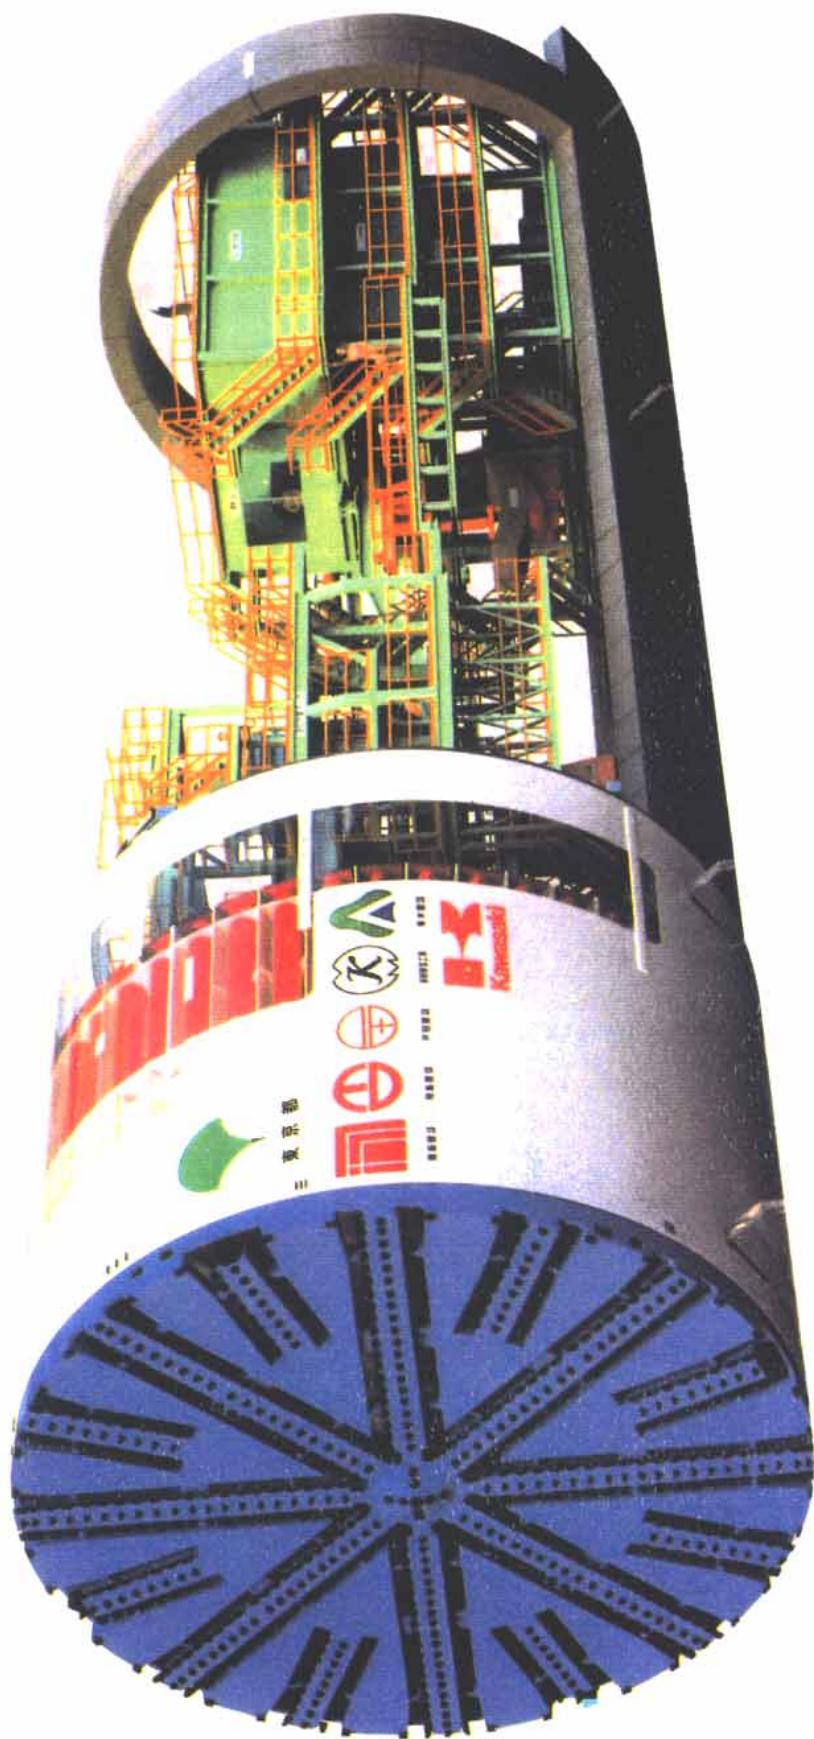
TBM Used in underground River beneath Loop Road No. 7
